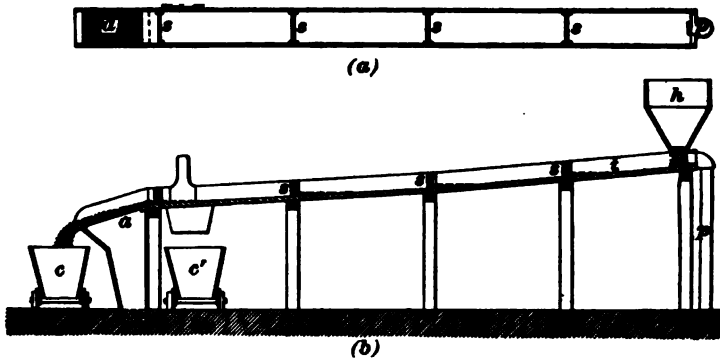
PLAN AND SECTION OF TROUGH WASHER
